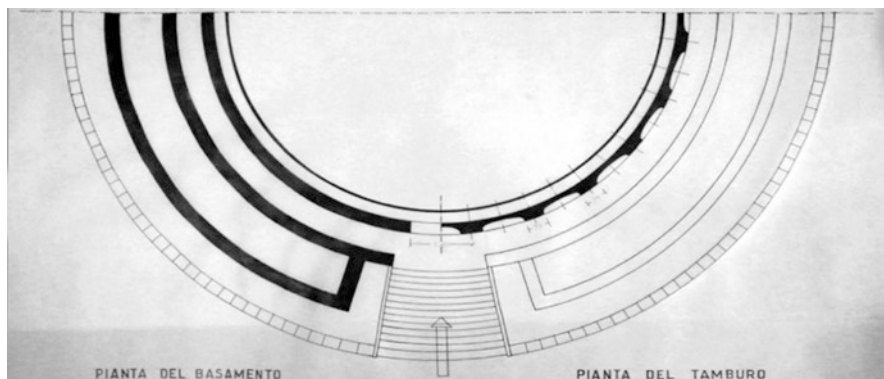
Plan of the Water Tank, about 1937. (© Acquedotto Pugliese Archive, 18-2-C-6-120/121)
